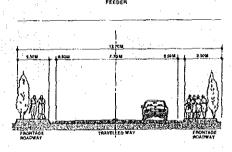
STANDARD CROSS-SECTION OF INTER-URBAN ROAD
